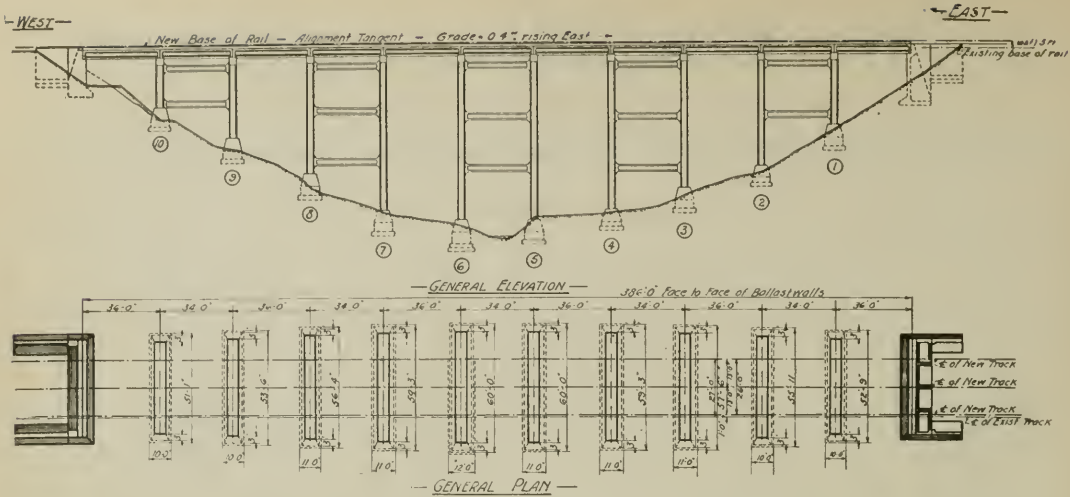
General Plan and Elevation, C.P.R. Concrete Trestle
